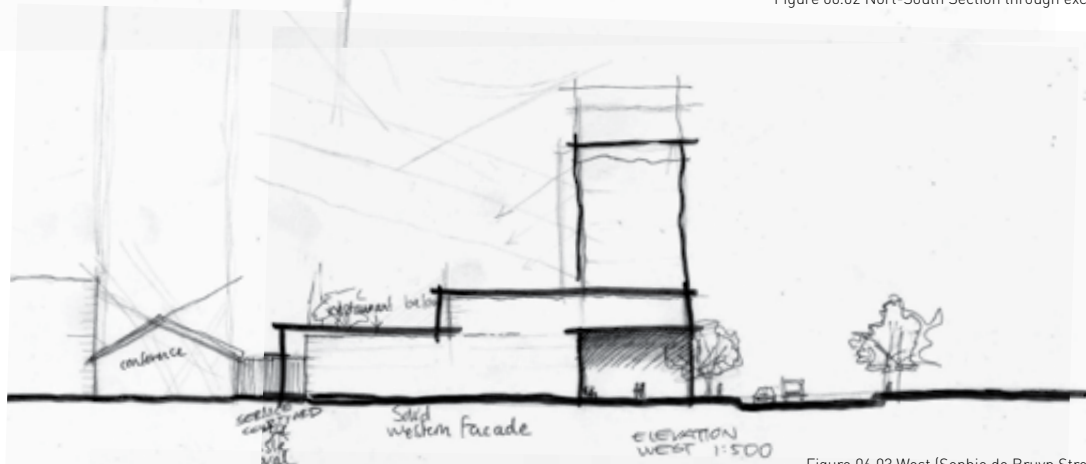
West (Sophie de Bruyn Street) Elevation
